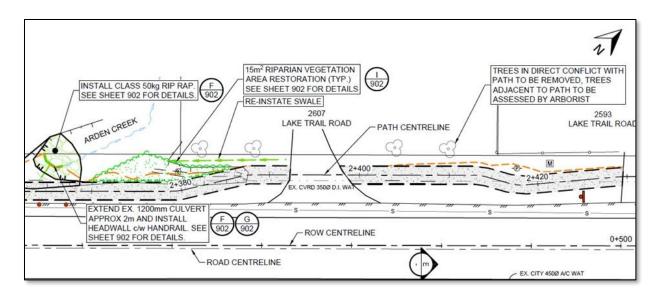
Proposed scope activities at approximate 2+360 where Arden Creek flows under Lake Trail Road towards the north. Modifications in this location include extending the existing culvert north into the creek, installation of a precast concrete headwall, vegetation removal, and re-instating a swale to direct surface flows into the creek.
